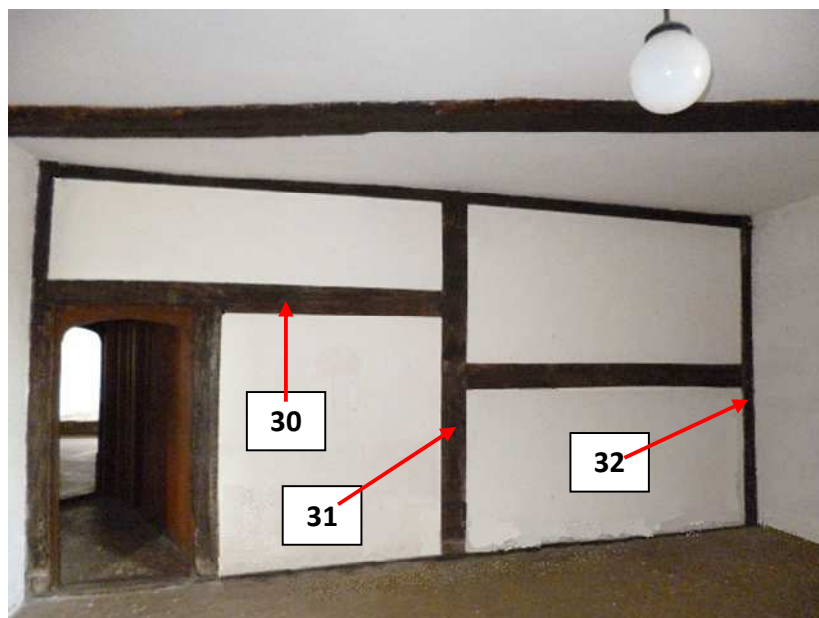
Photograph to help locate sampled timbers from the north-east ground-floor partition wall (photographs Robert Howard)
